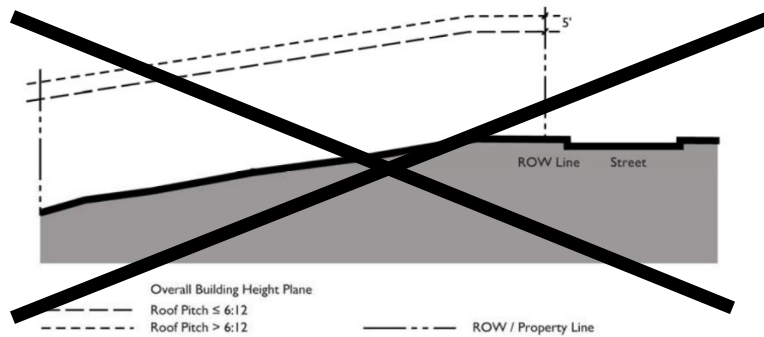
B. Pitched roof building height measurements (not drawn to scale).
